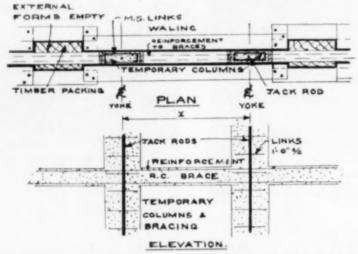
Temporary Concrete Columns to Support Jack-rods at Wall Openings. and 8 ft. 3 in. at the top of the shaft. The thickness of the wall varies from 18 in. at the bottom to 6 in. immediately below the coping. Therefore, in addition to the vertical motion of the forms, two other motions were required to reduce the diameter of the shaft and the thickness of the walls as the forms proceeded upwards. The forms were constructed partly of steel, and comprised six uprights inside the shaft to which was attached the internal sheeting, and which were kept in their correct position by two sets of six threaded horizontal tie-rods. One set was just above the level of the concrete and the other about 8 ft. higher. By tightening the horizontal rods systematically as the forms were jacked up, the internal diameter was reduced as required. Six external uprights were provided and were staggered in relation to the internal uprights, and were connected to them indirectly through a link motion. The lengths of the links were so proportioned that the thickness was reduced automatically as the internal diameter was reduced. The sheeting was attached to the soldiers and was 4 ft. deep, and was in pieces of a constant width. The boards were I in. thick. In
